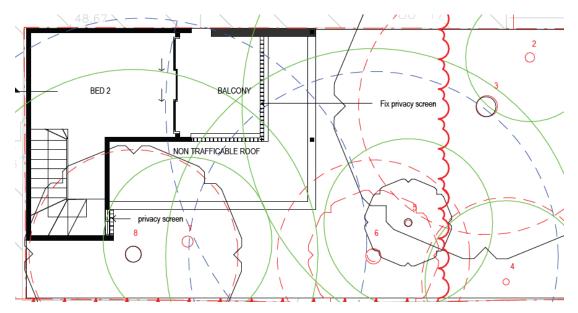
Secondary dwelling level two floor plan, presented at 1 November 2023 LPP Meeting
